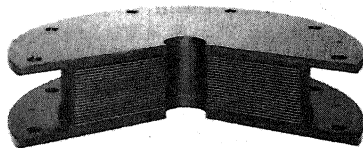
200-ton Rubber Bearing Cut to Show Construction.
